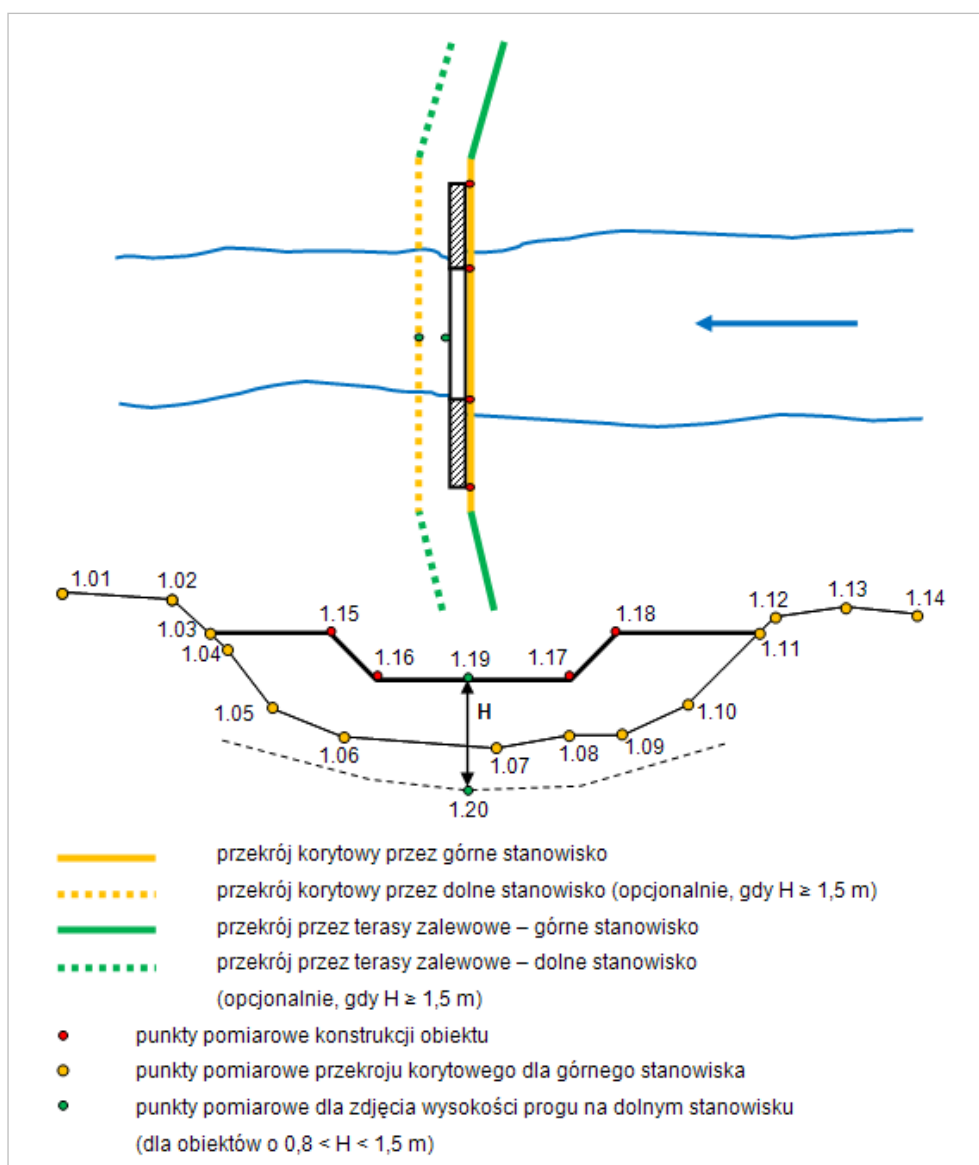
Site plan and picket arrangement diagram for hydrotechnical objects such as dams, weirs and water levels
